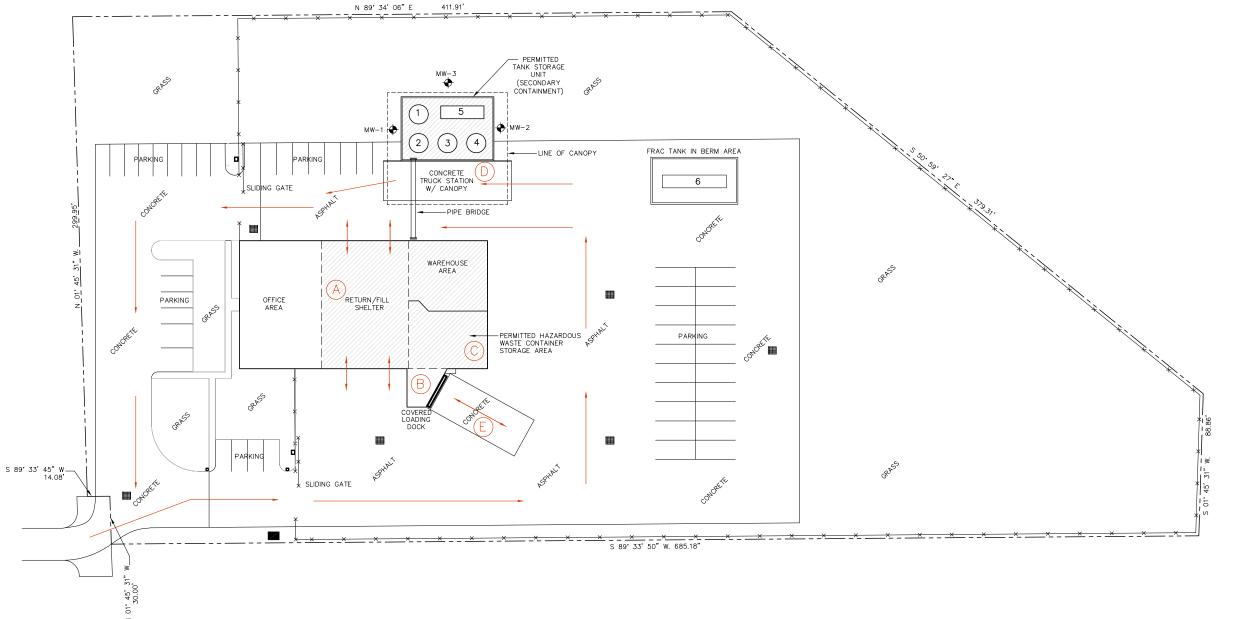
FACILITY LAYOUT & ACCESS CONTROL FEATURES
